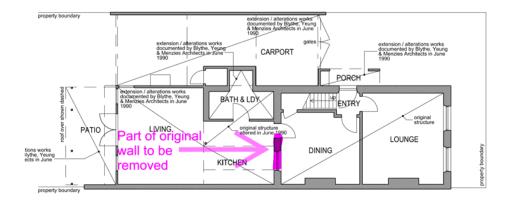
Floor Plan showing the portion of the original wall proposed to be removed
